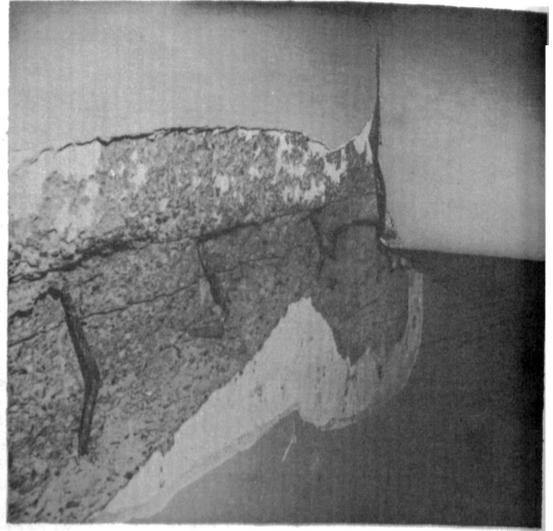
Movement along construction joint of interior shear wall, Anchorage-Westward Hotel.
